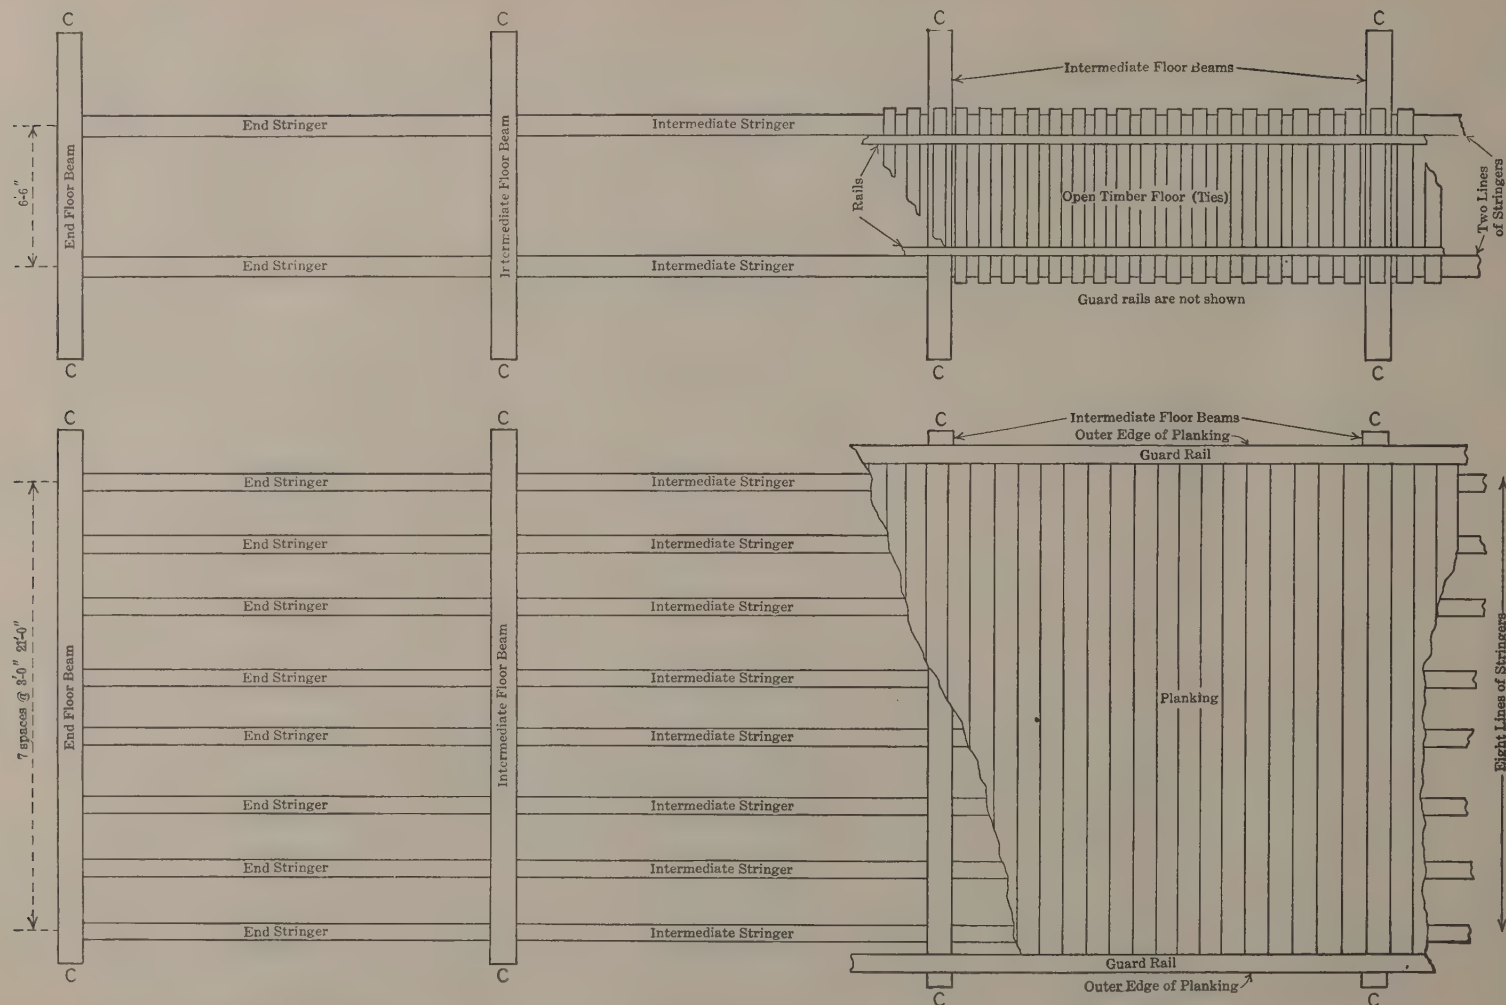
Plans of Floor Systems for a Railroad and a Highway Bridge. Floor beams are connected to the trusses at the points marked "C."
